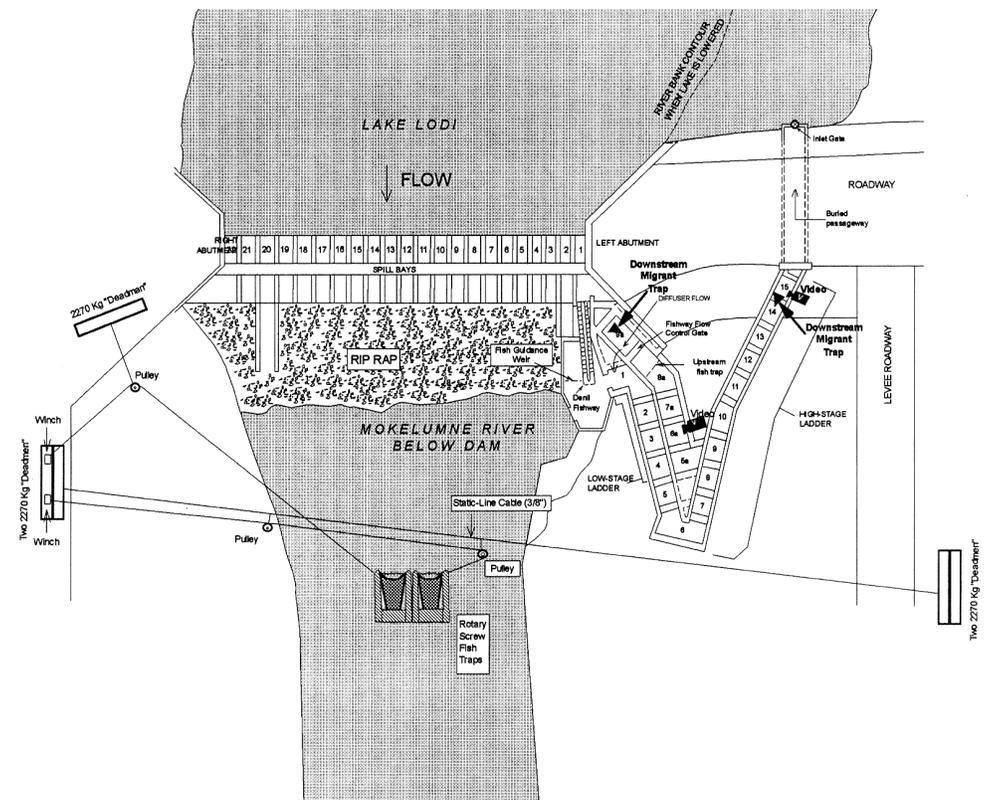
Plan view of Woodbridge Dam showing video monitoring sites and location of upstream migrant fish trap
